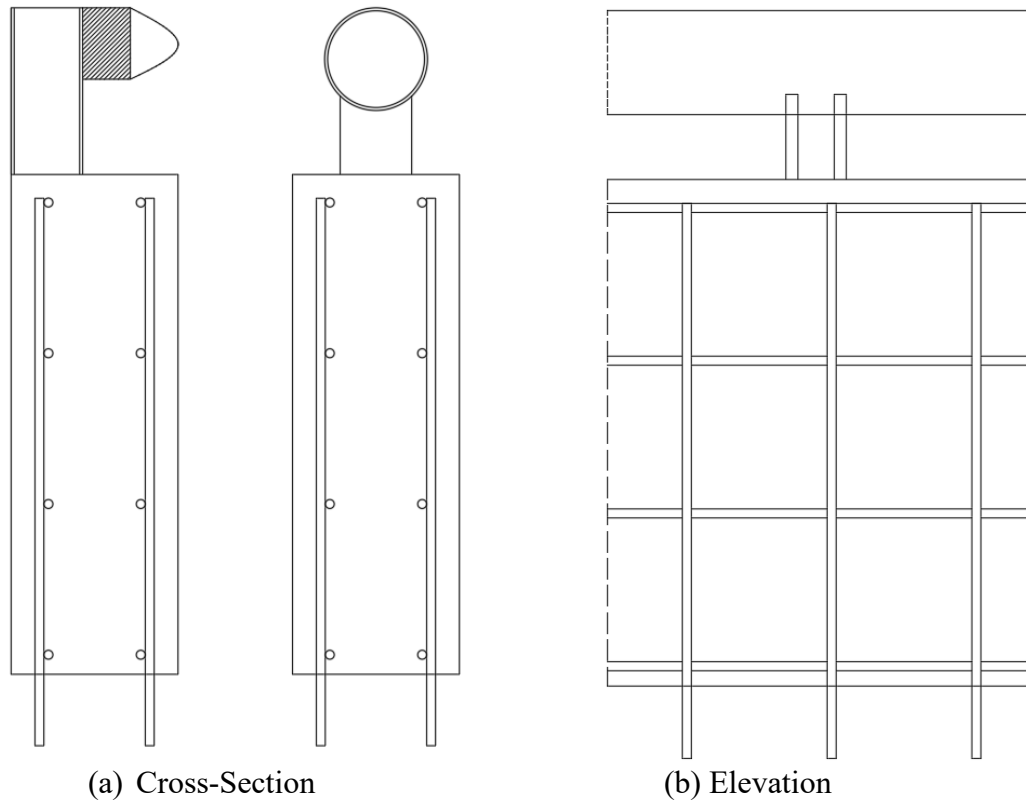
Concept 3 – Rigid Wall and Deformable Rail
